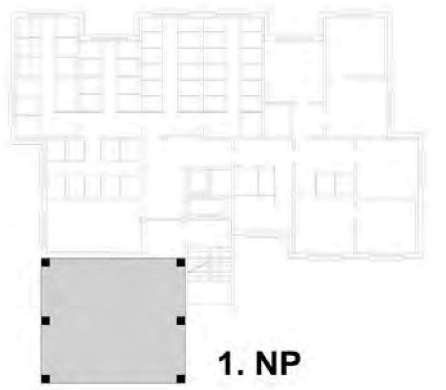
Extension of the modular system to the facade of an apartment building - an example of the location of the apartment (Zdroj: „TETRIS CITY“ design)
